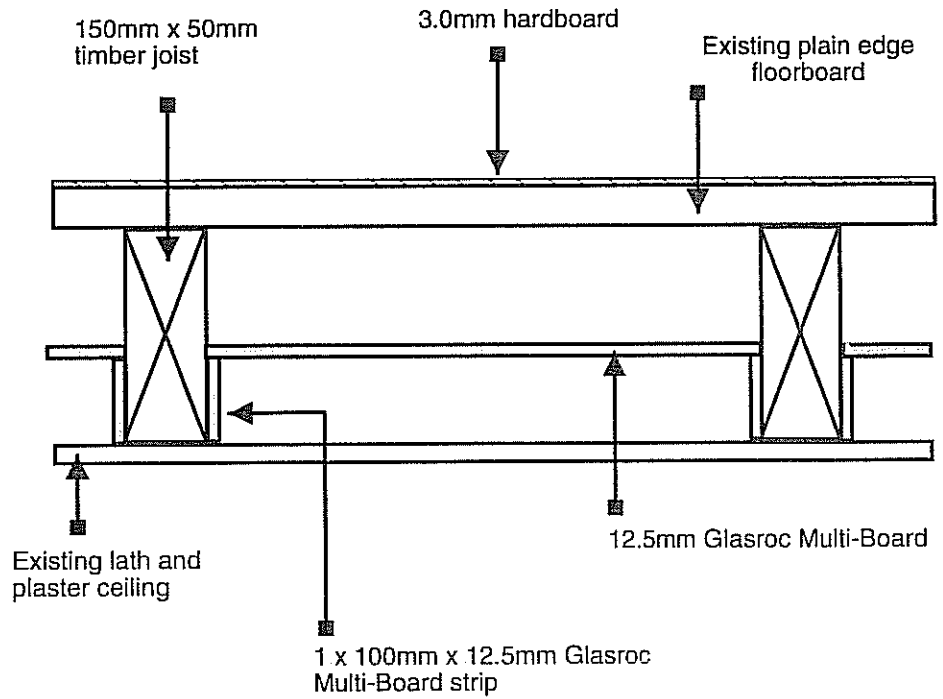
Use of Glasroc Multi-Board above an existing ceiling to provide 60 minutes fire resistance
